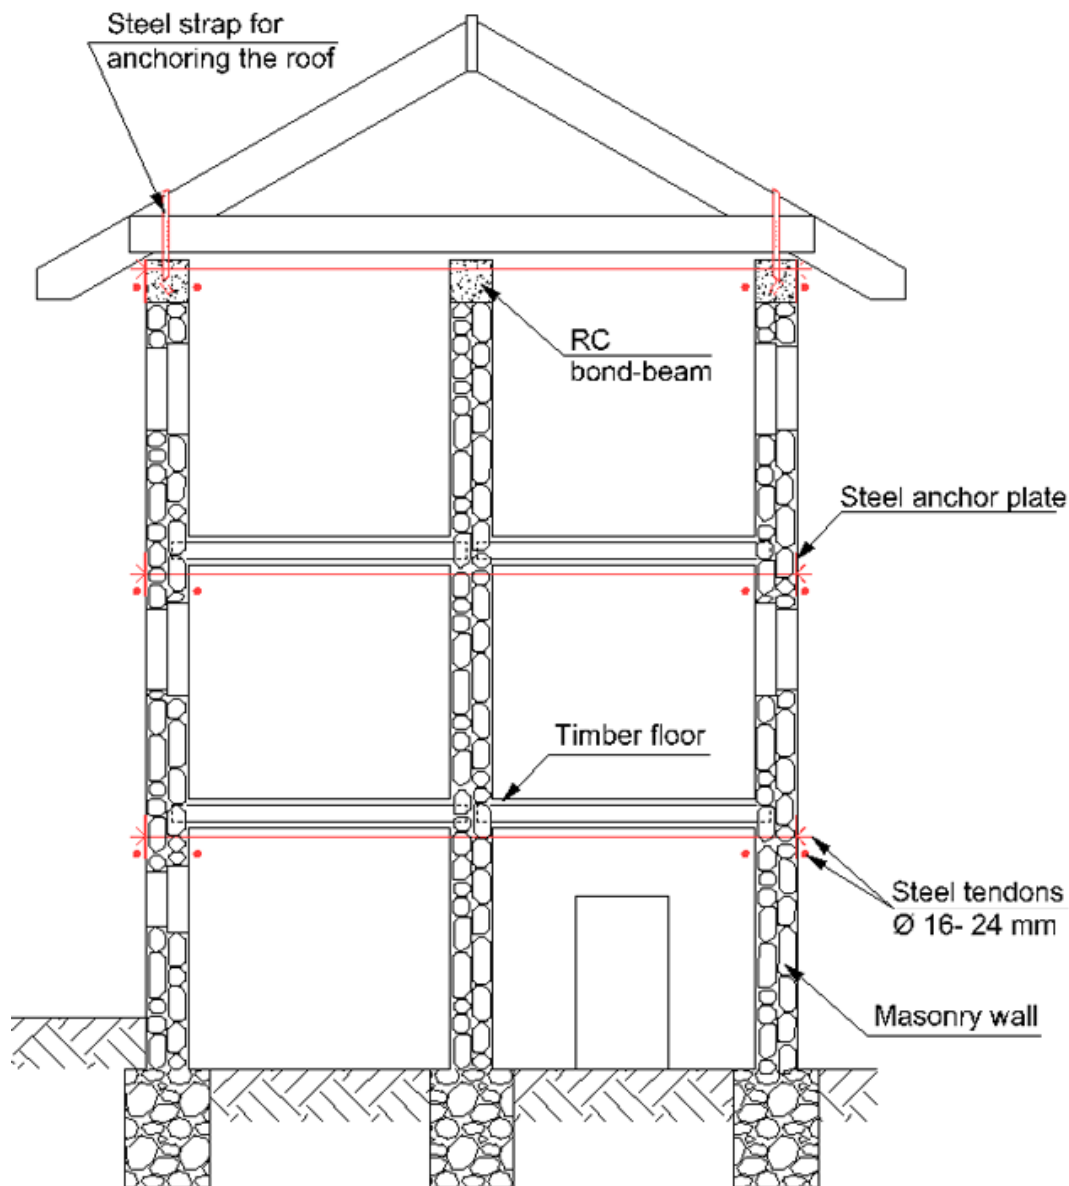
Vertical position and distribution of steel ties for brick & stone masonry house
